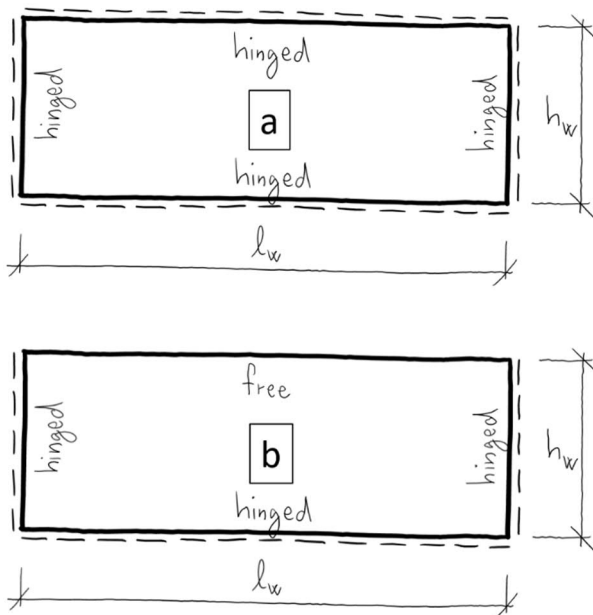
Scheme of a) internal and b) outstand wall with hinged boundary conditions.
